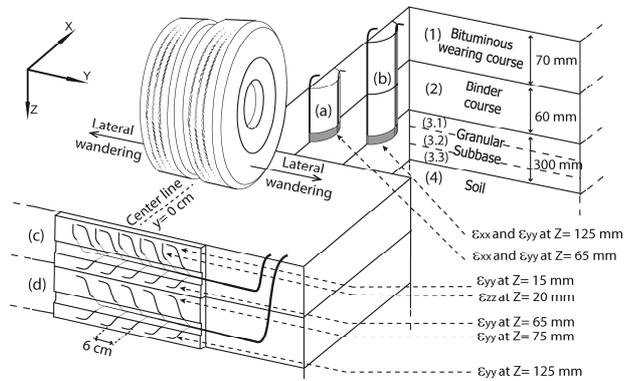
Configuration and instrumentation of the structure A (two instrumented concrete cores (a and b) and two instrumented polymeric plates (c and d))
